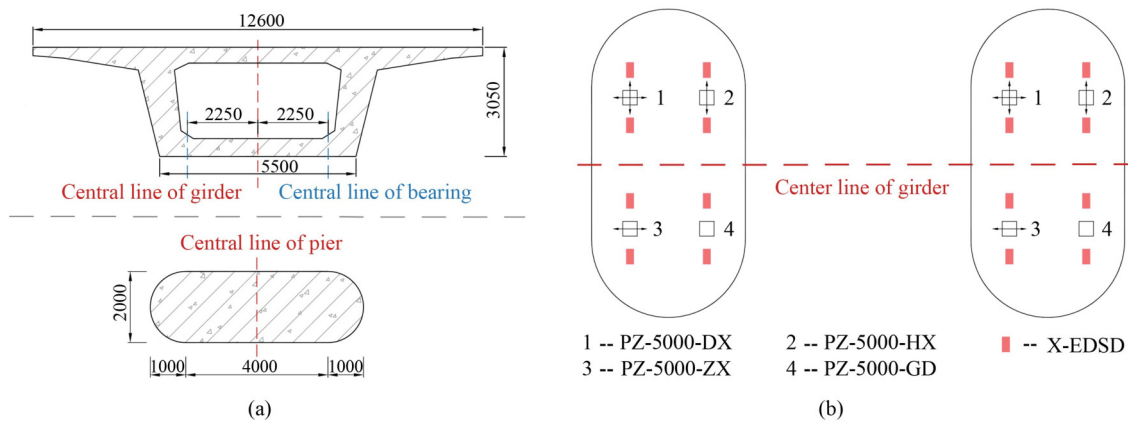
Cross-sectional dimensions of the girder piers and bearing arrangement: (a) sections of the girder and pier; (b) layout of the bearing system.
